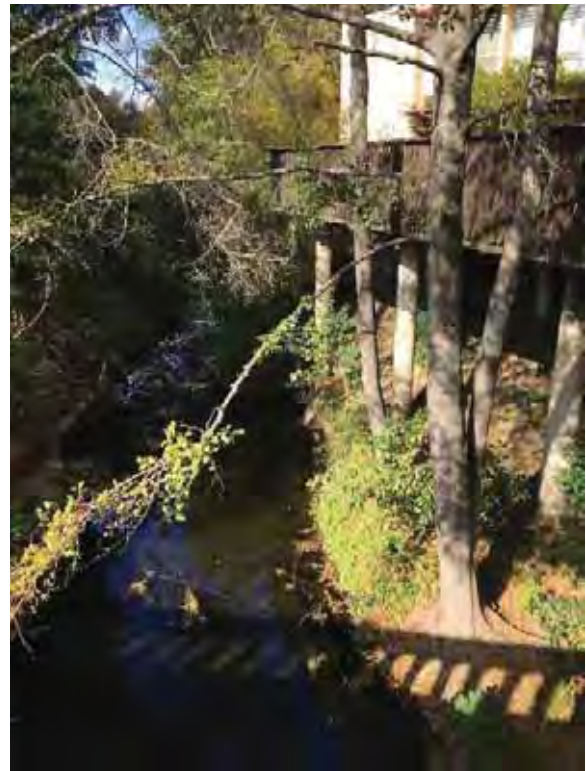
View of Channel Upstream of Center Avenue Bridge
